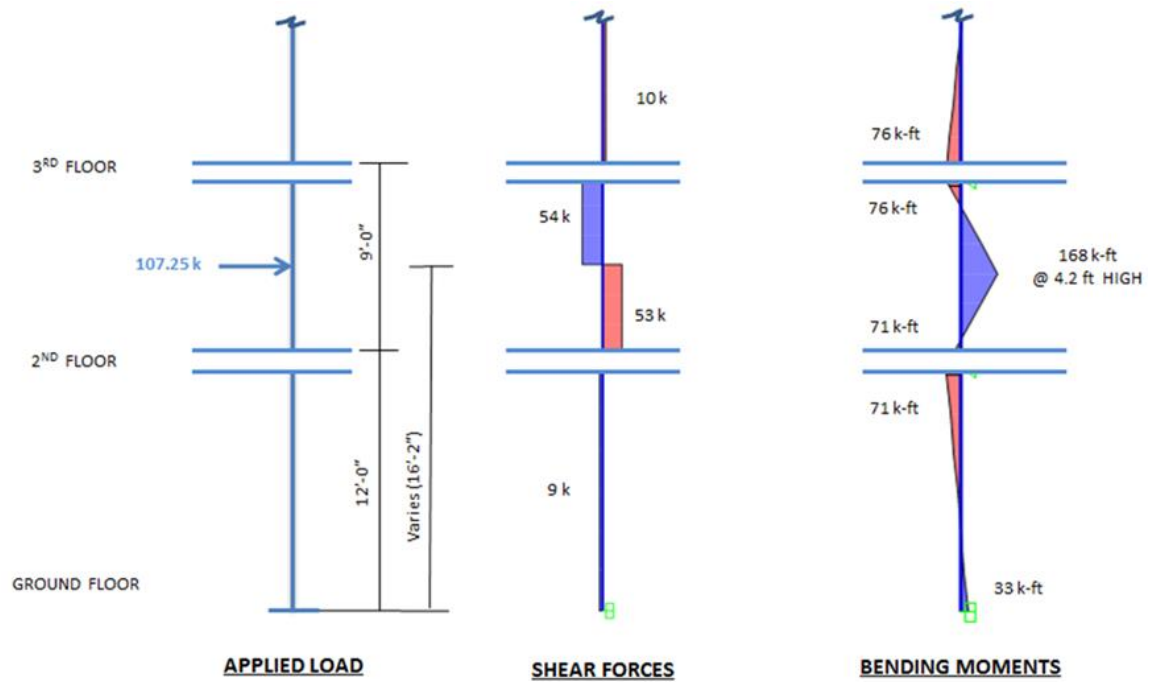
Impact load applied at mid-height of assumed lateral restraint points at top and bottom of the 2nd floor column
